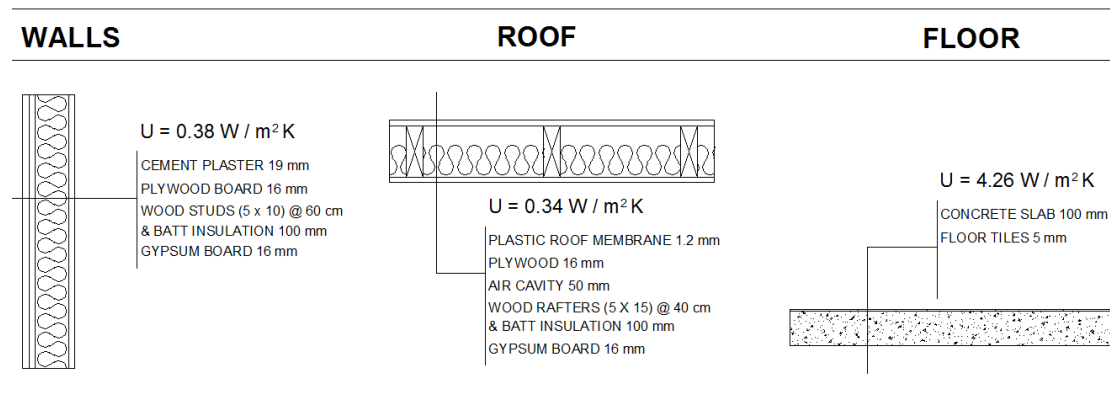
Wall, roof and floor construction of the light weight insulated building.
